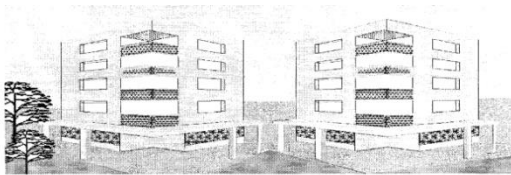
Jalis used as balcony parapets and dead walls as seen above.
